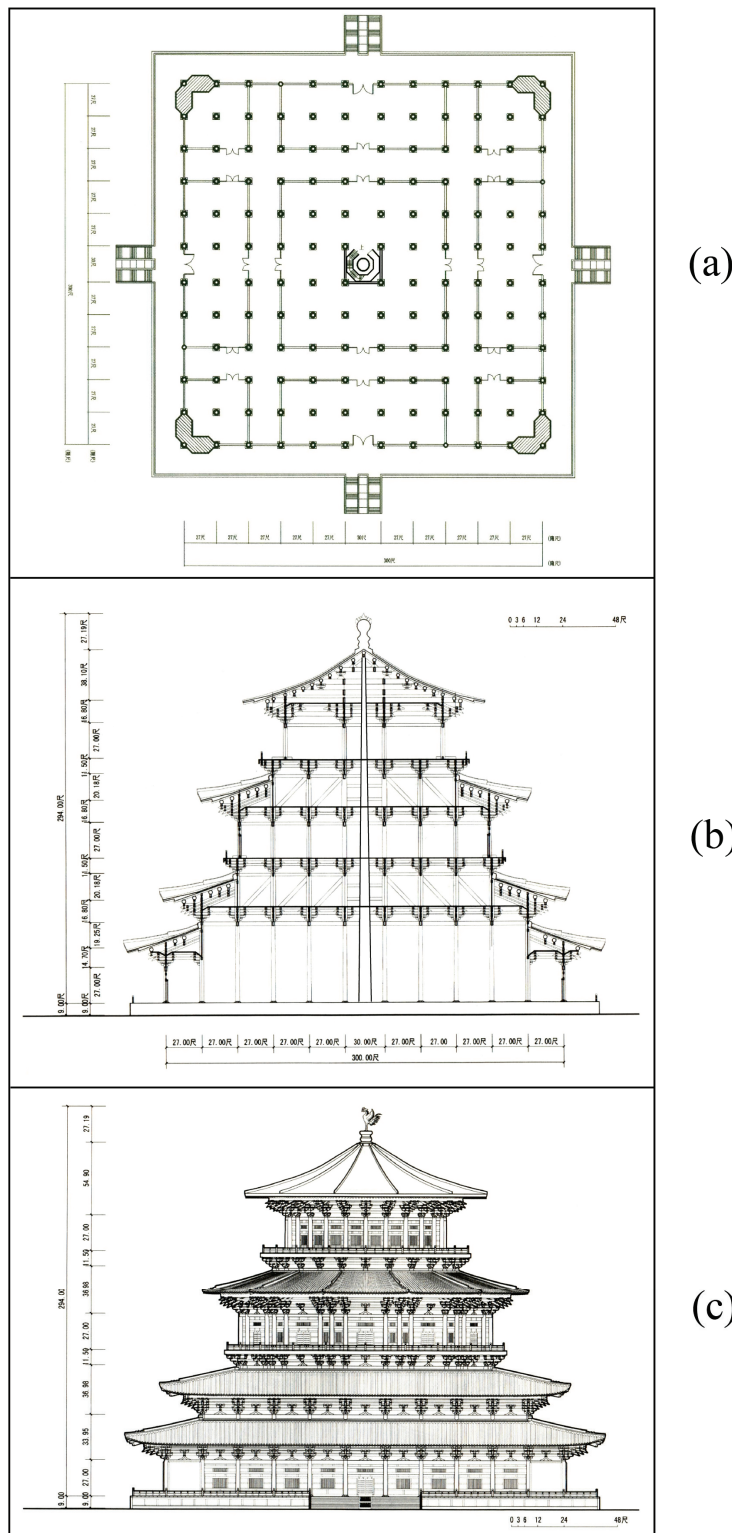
The reconstructed pictures of Wu Zetian’s Bright Hall. (a) The plan of the ground floor; (b) the vertical section with a copper fireball as the top decoration; (c) the elevation with a gilded iron phoenix as the top decoration (from Wang 2011, pp. 417, 431–32, illustration 34, 44–45).
